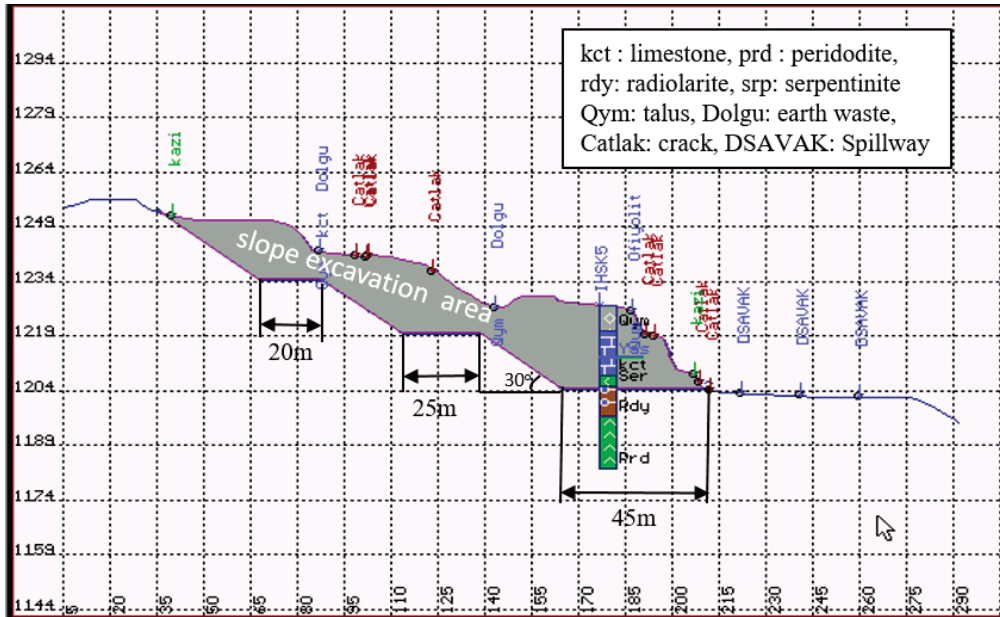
Excavation profile of unstable slope on the cross section of DKY8 – 0+140.
